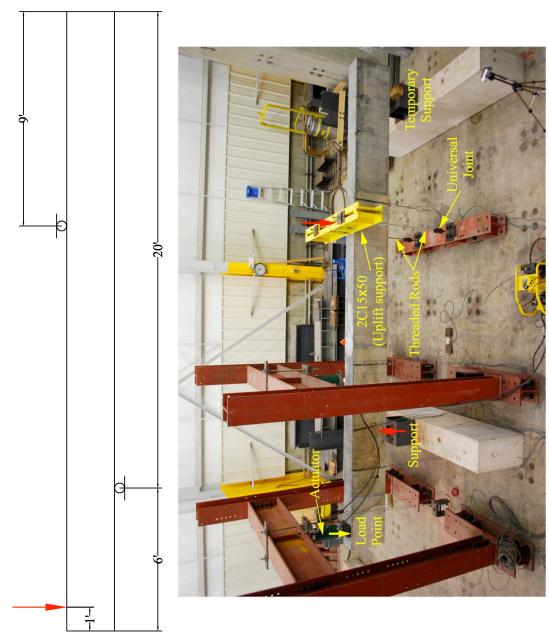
Loading and Test Setup for Specimens SR3 and SR4
